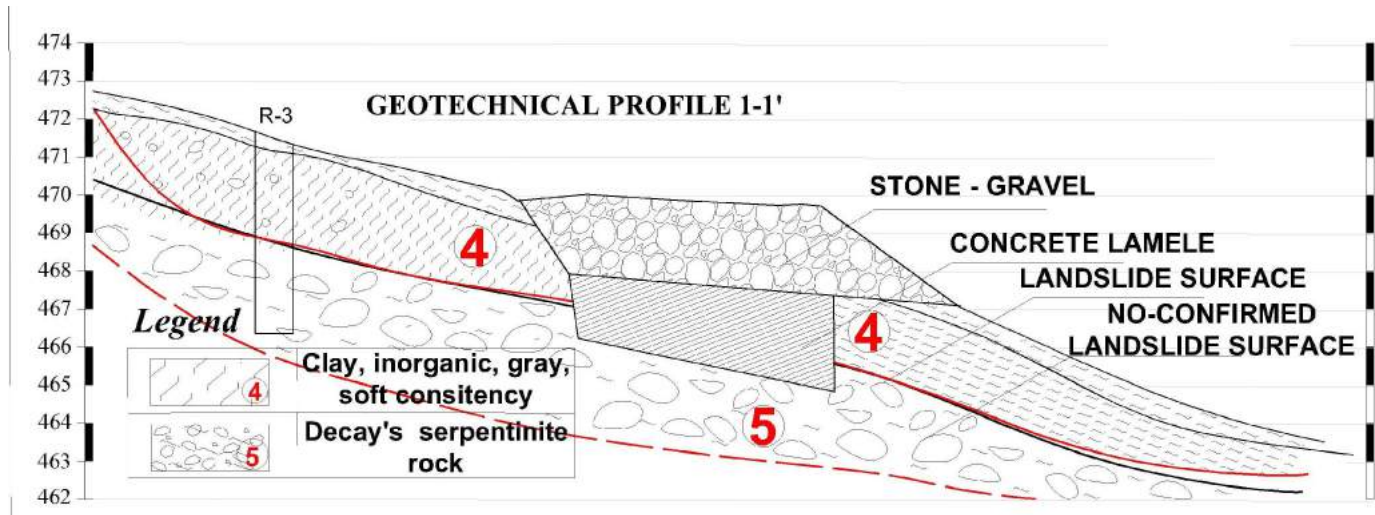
Concrete lamellas at K-12 landslide as a substitution for retaining wall
